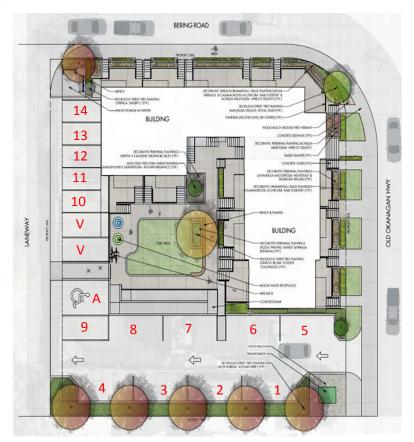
14 parking spaces provided for the 14 townhouse units, 1 accessible parking space, and 2 visitor parking spaces.
